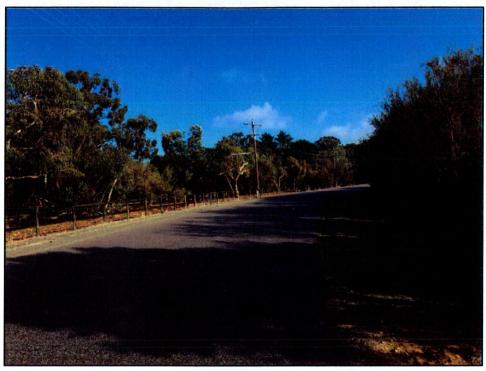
A westward view of Robinson Road from the current access point to Proposed Lot 1
